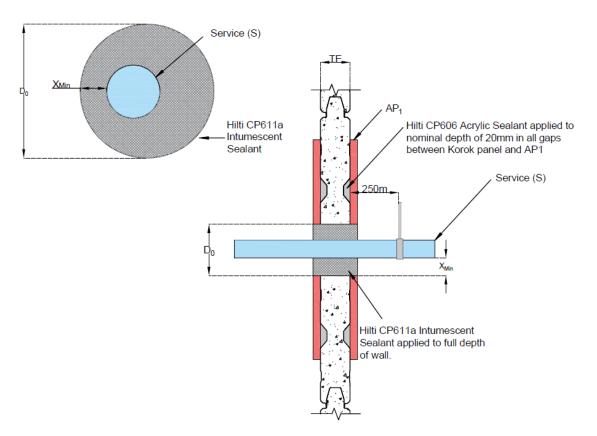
Single cables through 78 mm thick Korok panels with AP1 additional protection
